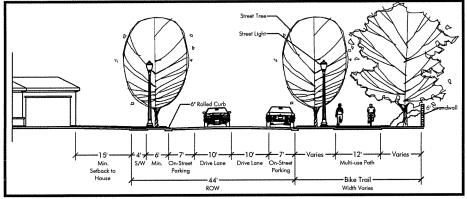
Neighborhood Street at Parkway - Woodbridge by Del Webb, Section F Bike Trail- Rear Yard, Varying Right-of-Way
